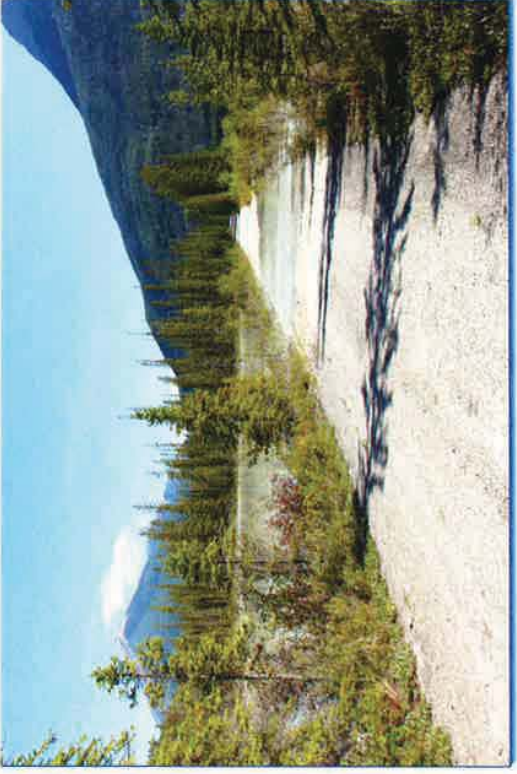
Bridge Crossing on Kicking Horse River, Facing South over West side of Bridge.
